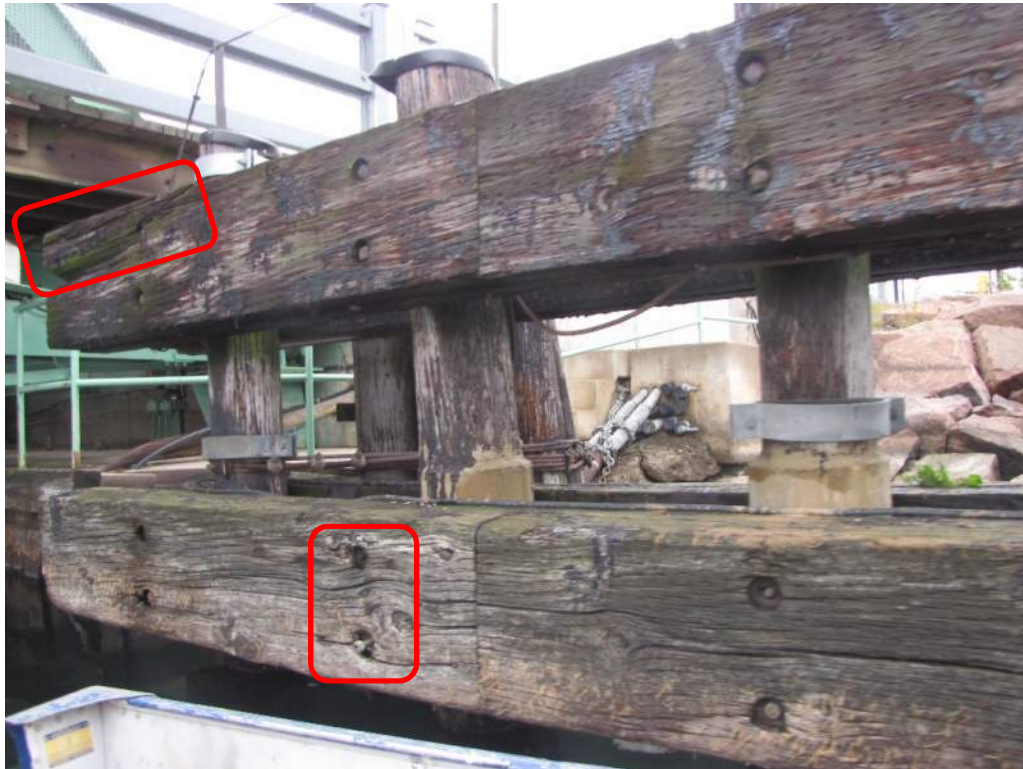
Severe rot in the upper fender at the north end of the east training wall. Note the loose (lower) and missing (upper) bolted connections in the lower fender.
